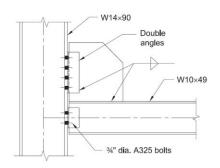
Beam-to-column connection that allows rotation (Stoakes and Fahnestock, 2010).
